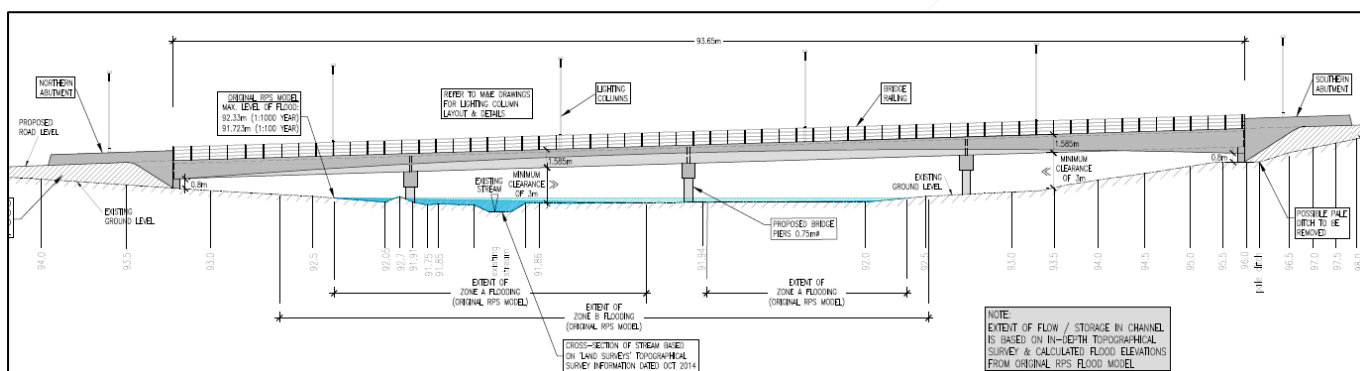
Extract from DBFL bridge elevation (proposed)
